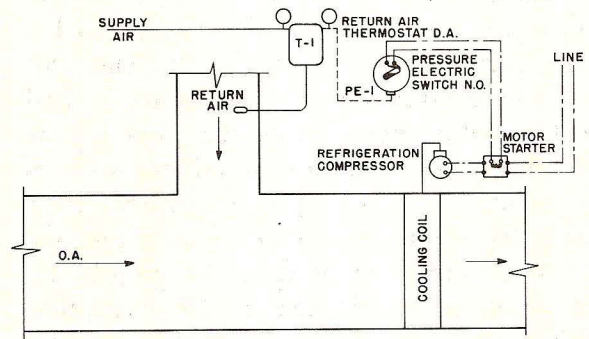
Typical Cooling Control by Starting and Stopping Cooling Compressor
